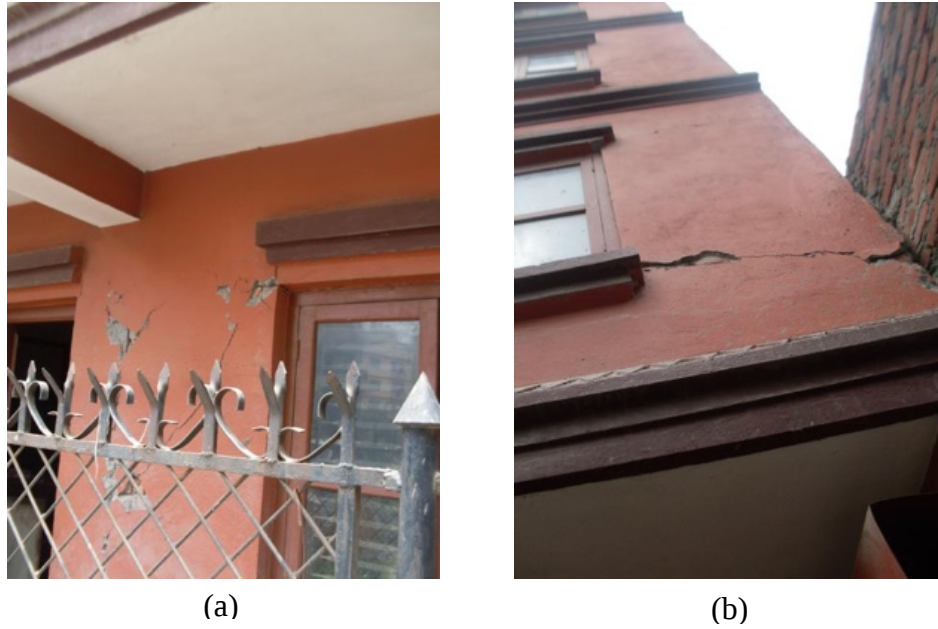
Damage to reinforced concrete elements confined the masonry on the eastern wall of the Gongabu Bus Park Building
